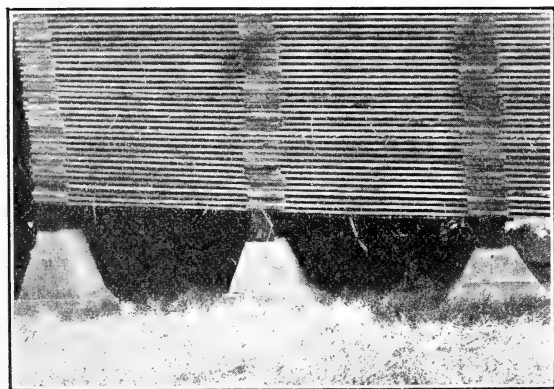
Concrete foundations with untreated skid timbers in general use in a mill yard at Laurel, Miss. Only two rows of piers are used for stock 14 feet or less in length.
